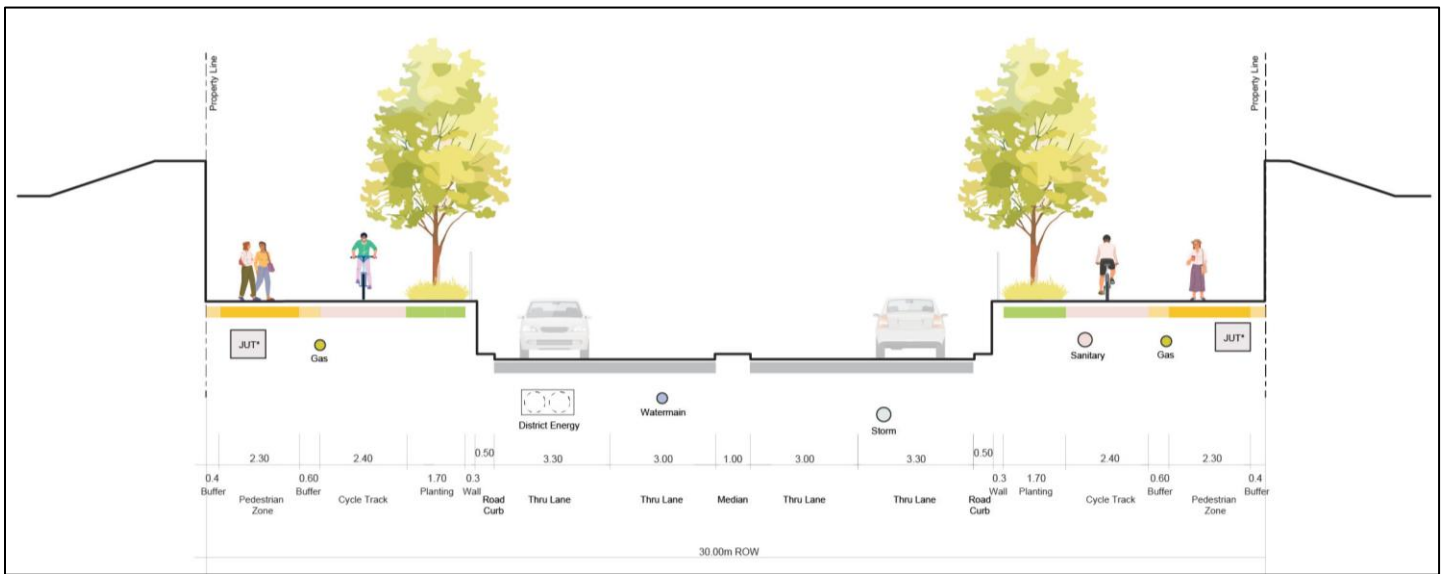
Northern Street (Underpass – Open to Sky) Cross-Section – Option 2
